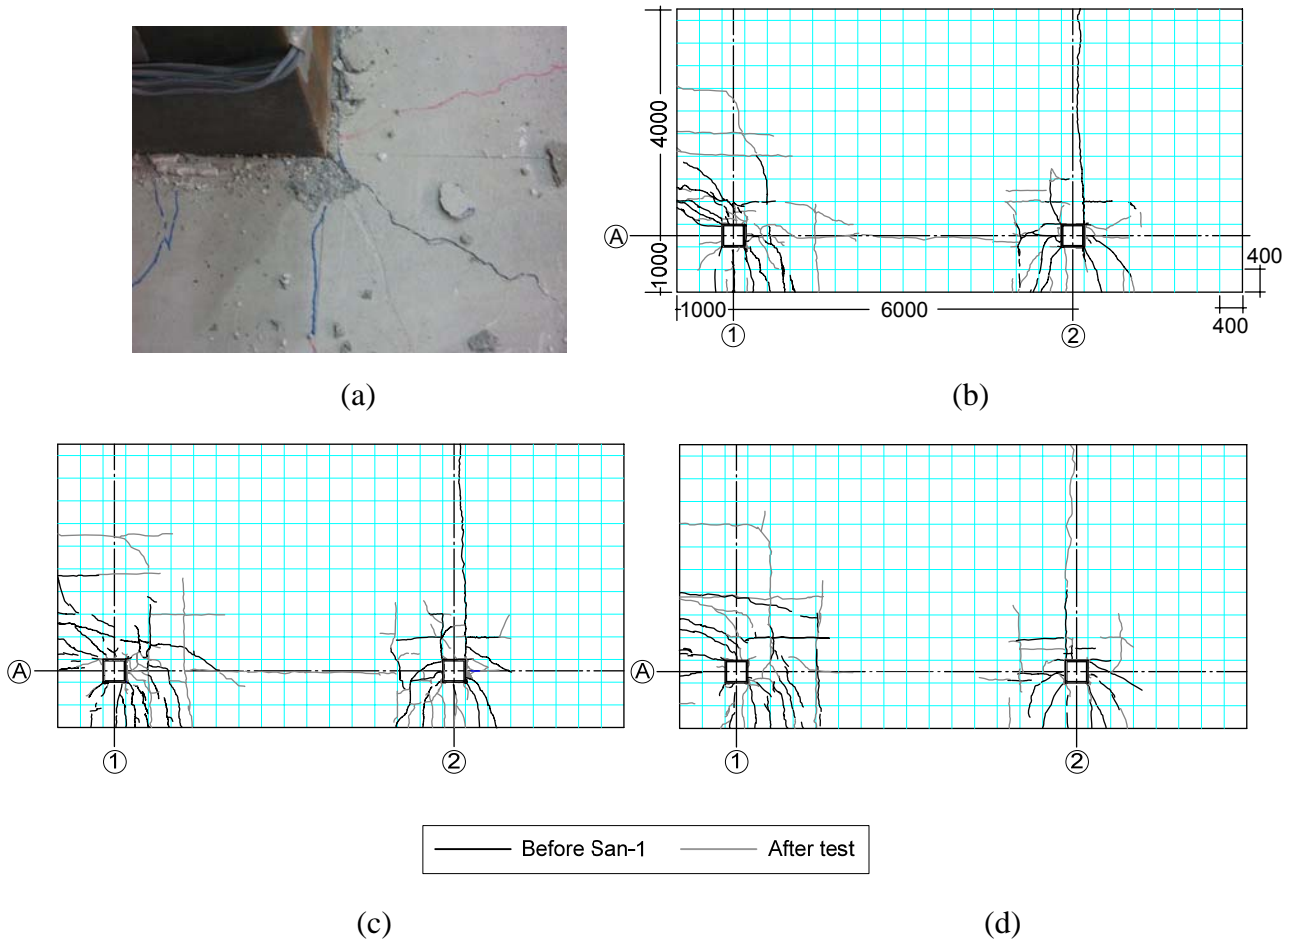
Cracks at RC floor slab: (a) A close-up of cracks; (b) Second floor slab; (c) Third floor slab; (d) Forth floor slab
